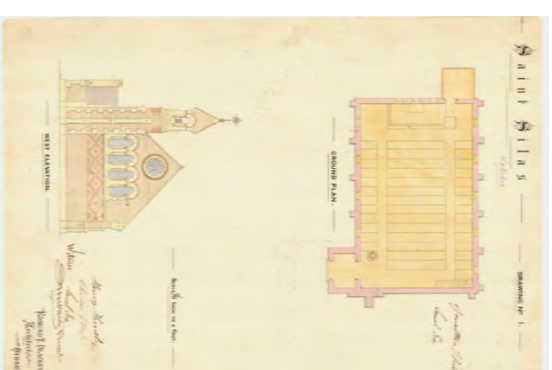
Plan and West Elevation of St Silas Church, drawings by Edmund T Blacket.
